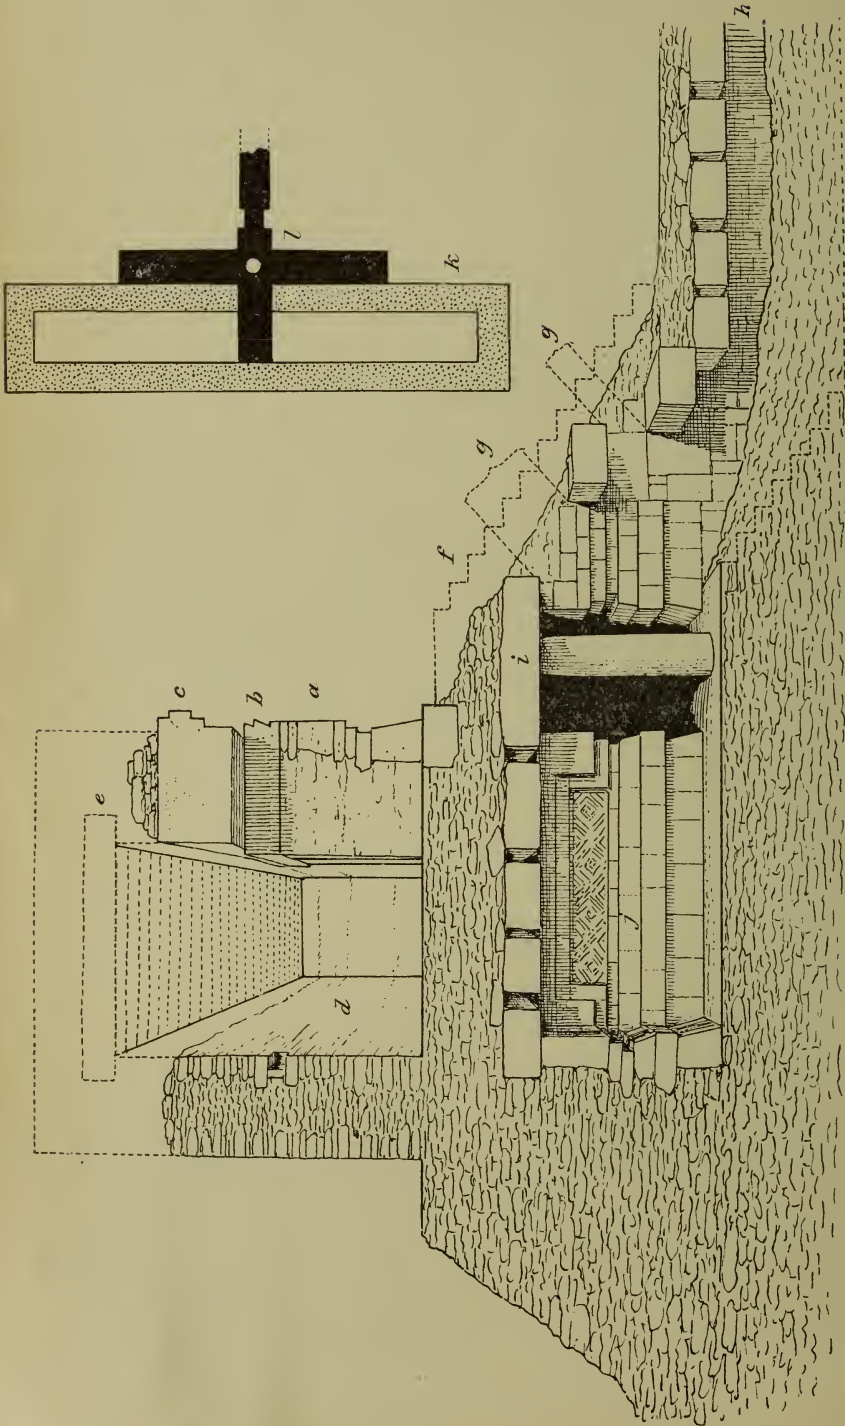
SECTION AND PERSPECTIVE OF THE BUILDING OF THE BASEMENT GALLERIES.
